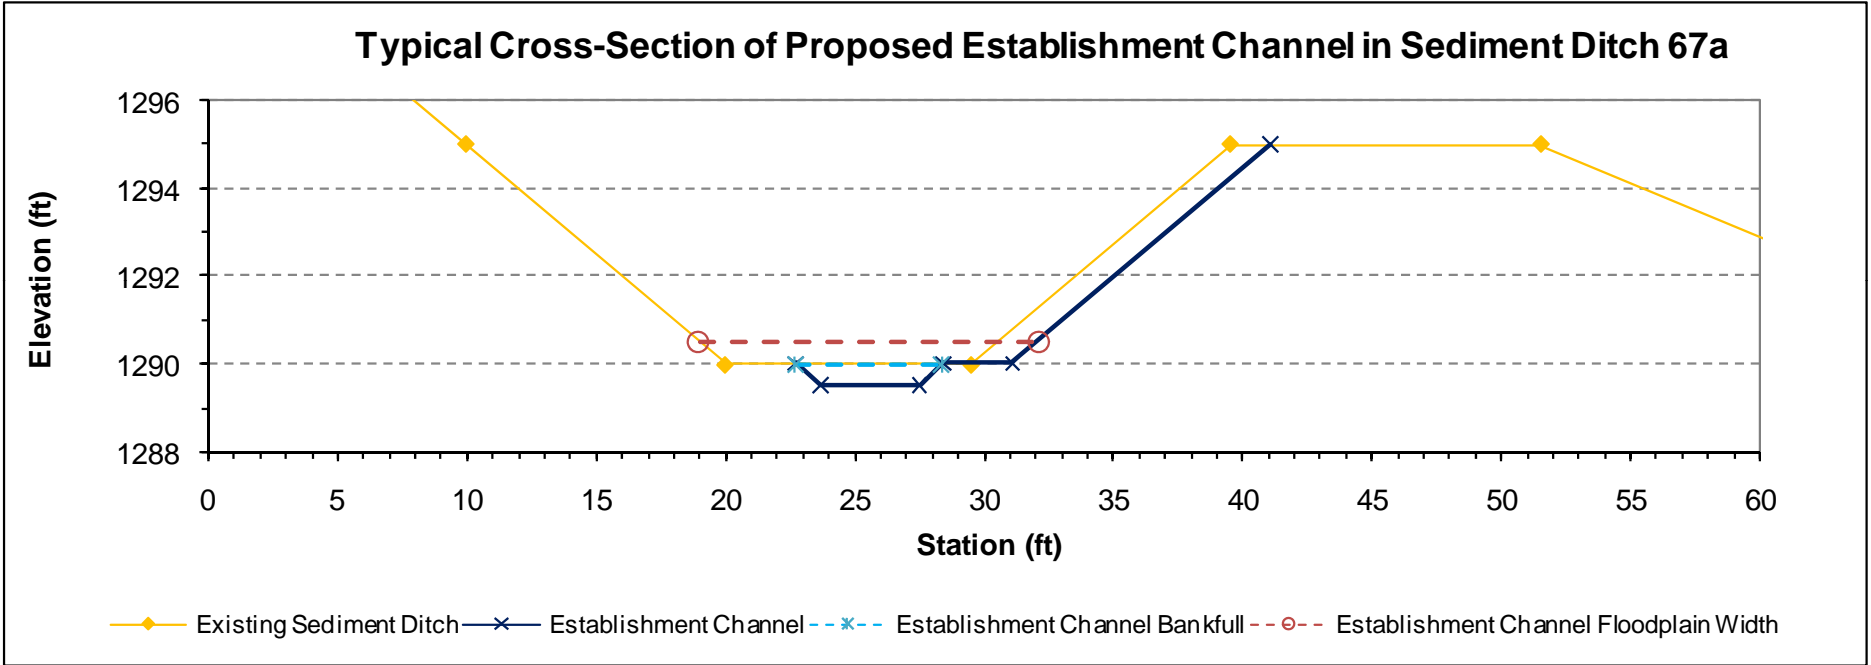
Typical Cross-Section of Proposed Establishment Channel in Sediment Ditch 67a (requires additional excavation for floodplain)
